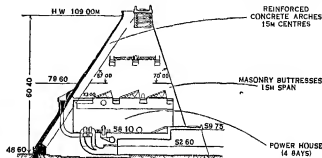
CROSS SECTION OF THE TIRSO DAM SARDINIA
